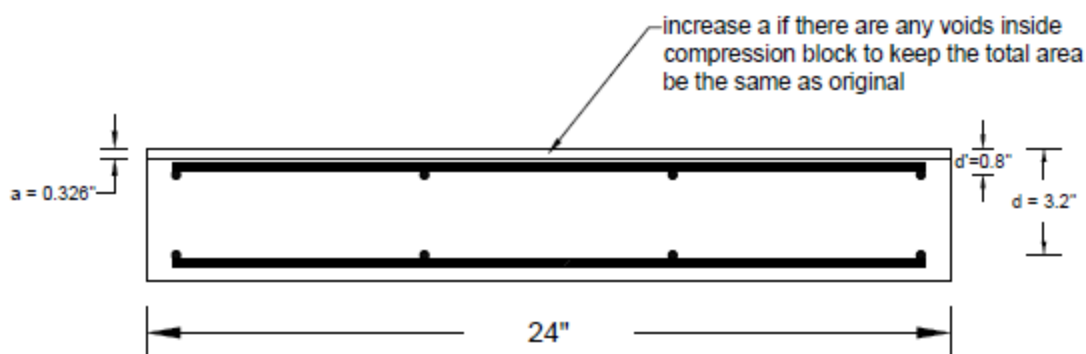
Top View of the Wall and the Compression Block in Horizontal Direction
